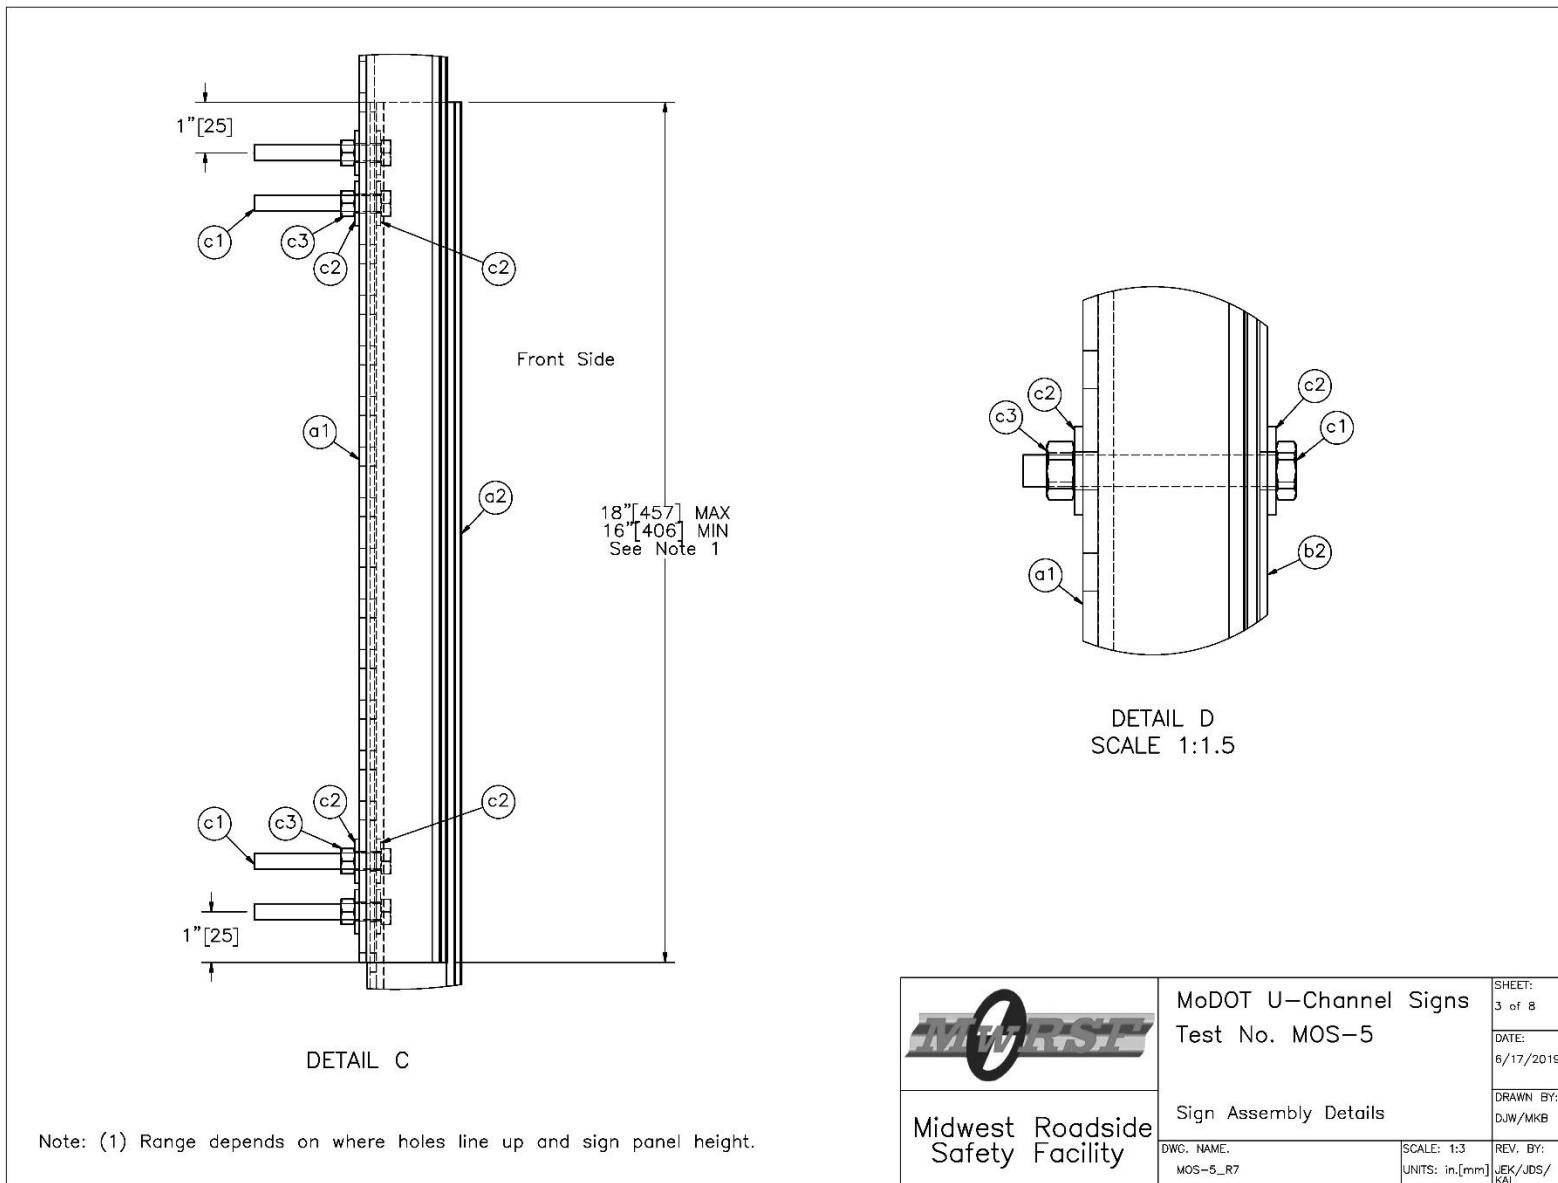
Sign Assembly Details, Test Nos. MOS-5 through MOS-7
